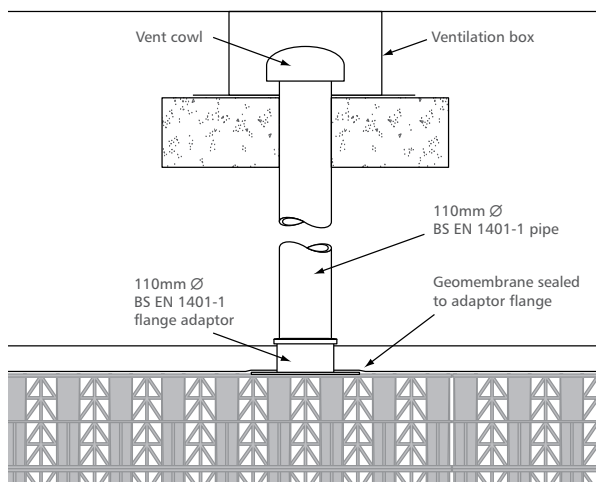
shows a vertical vent pipe with a cowl (SCV40). Figure 5-16 shows a horizontal vent pipe that connects to a catchpit.
